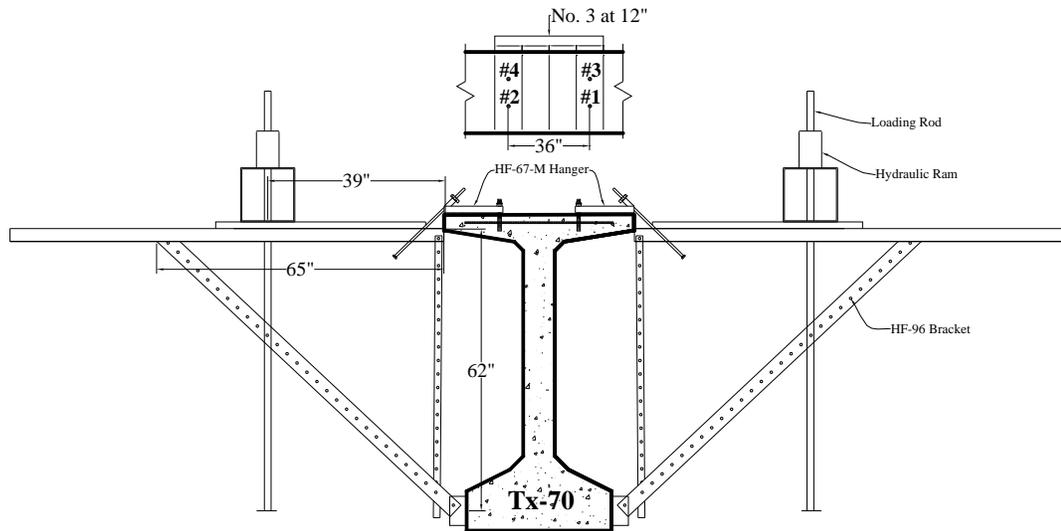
Reinforcement pattern and loading geometry for HF-67-M on Tx-70 Test 2
